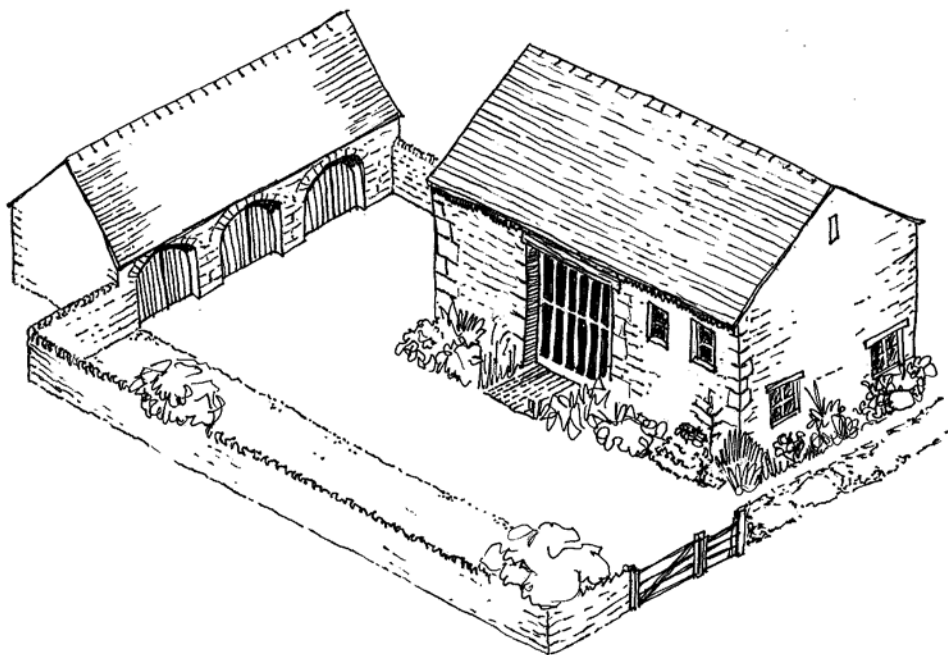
Farm barn and outbuilding sensitively converted. Showing a traditional farm/rural curtilage and boundary treatment, and garaging within existing outbuildings.
